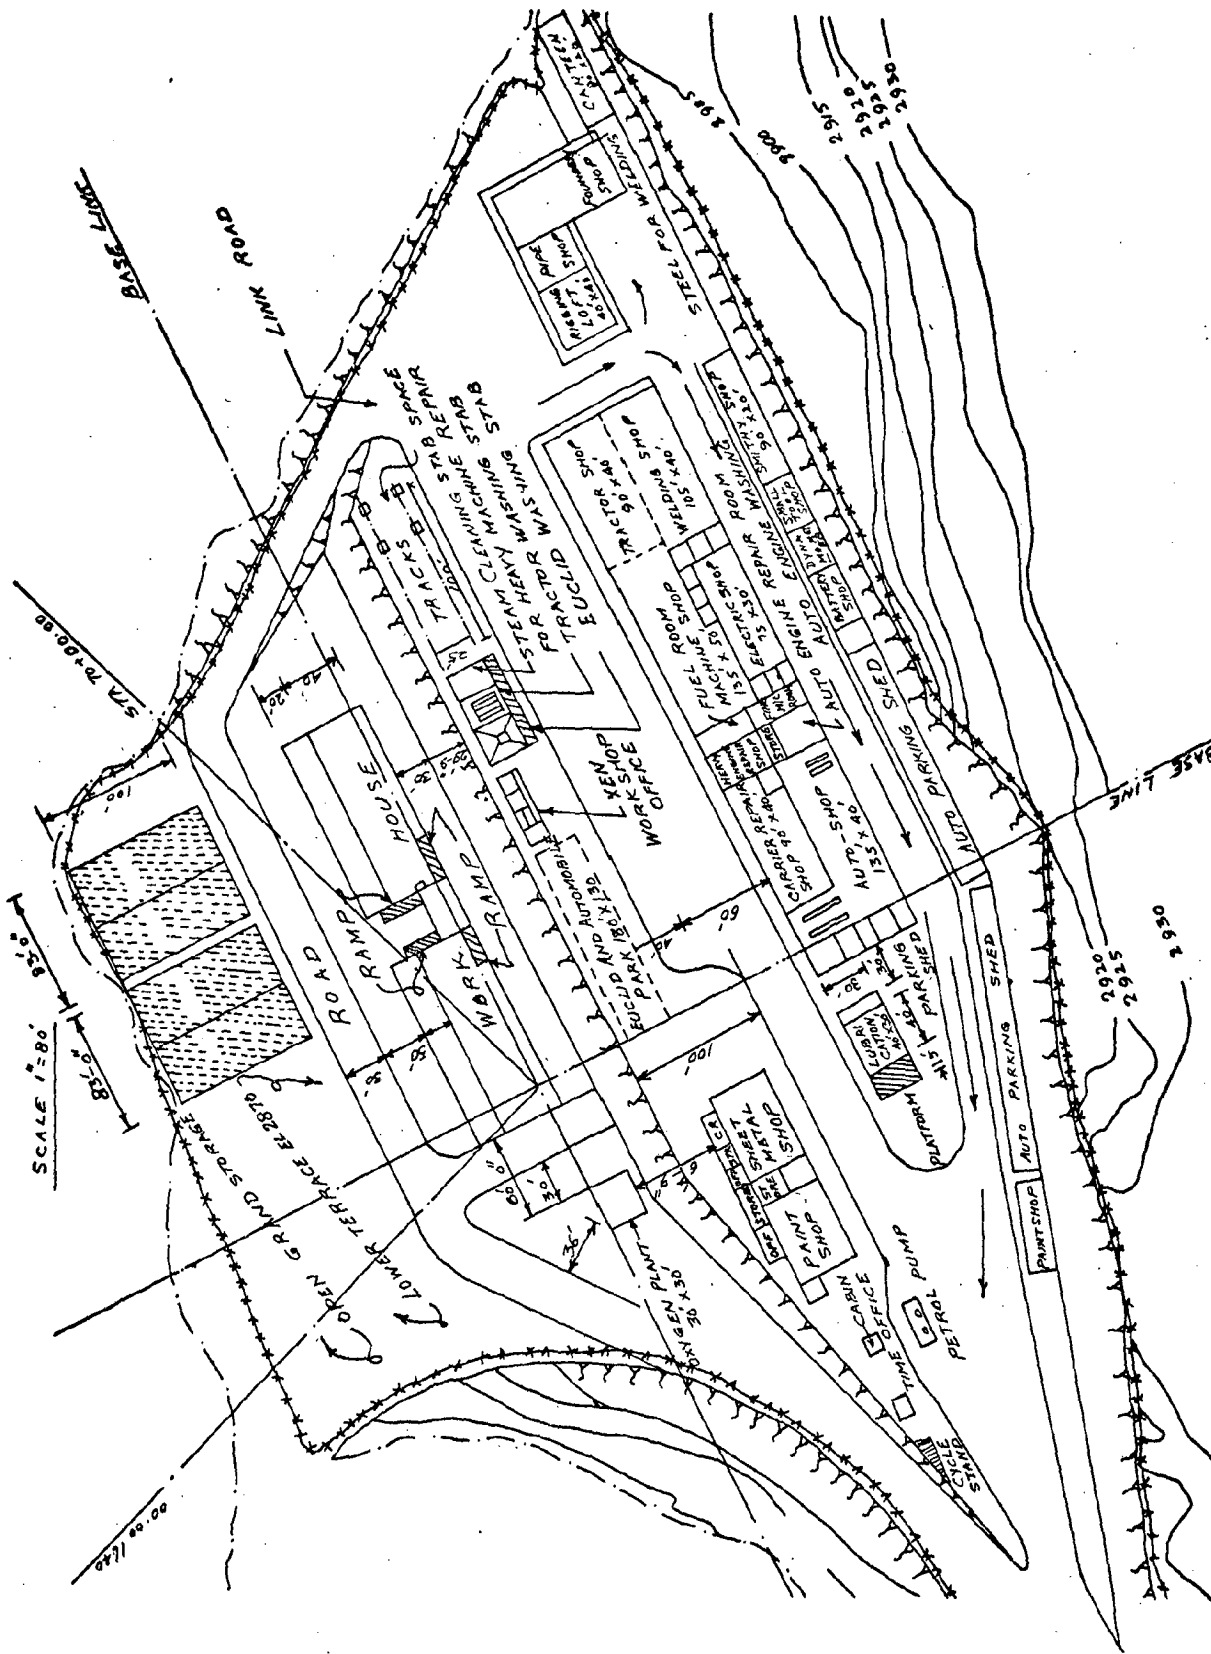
LAYOUT OF B.S.L. PROJECT WORKSHOP AT SUNDERNAGAR
